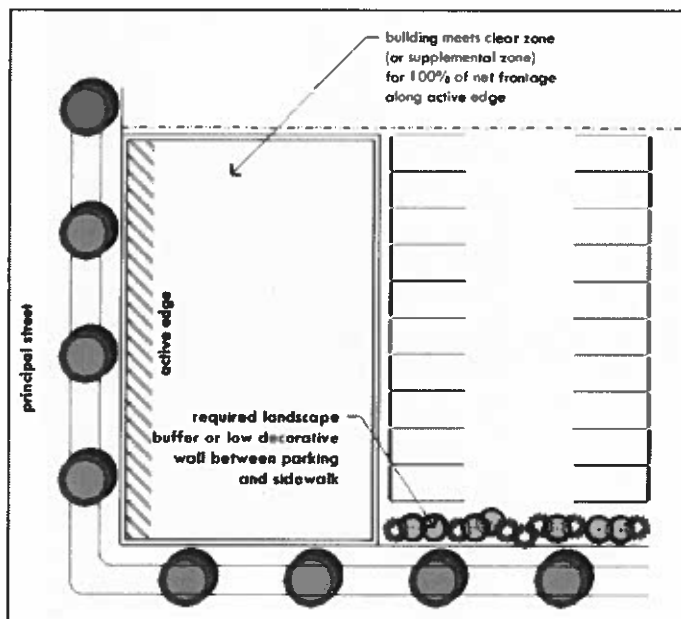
Building placement requirement along an active edge with required landscaping between parking and clear zone along other adjacent streets.
